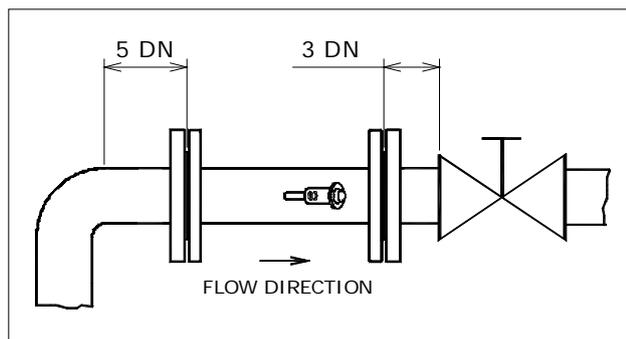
Minimum length of straight piping section at the input side of closing valve
